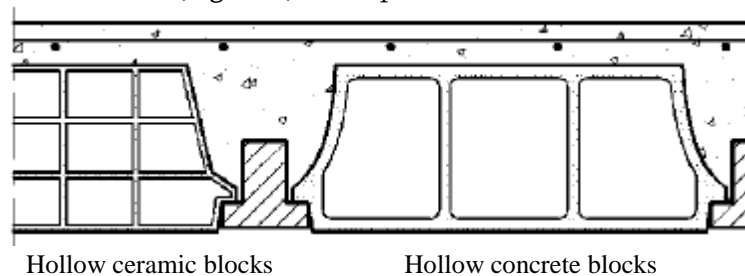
Structural solution for a floor slab with high-strength hollow blocks
